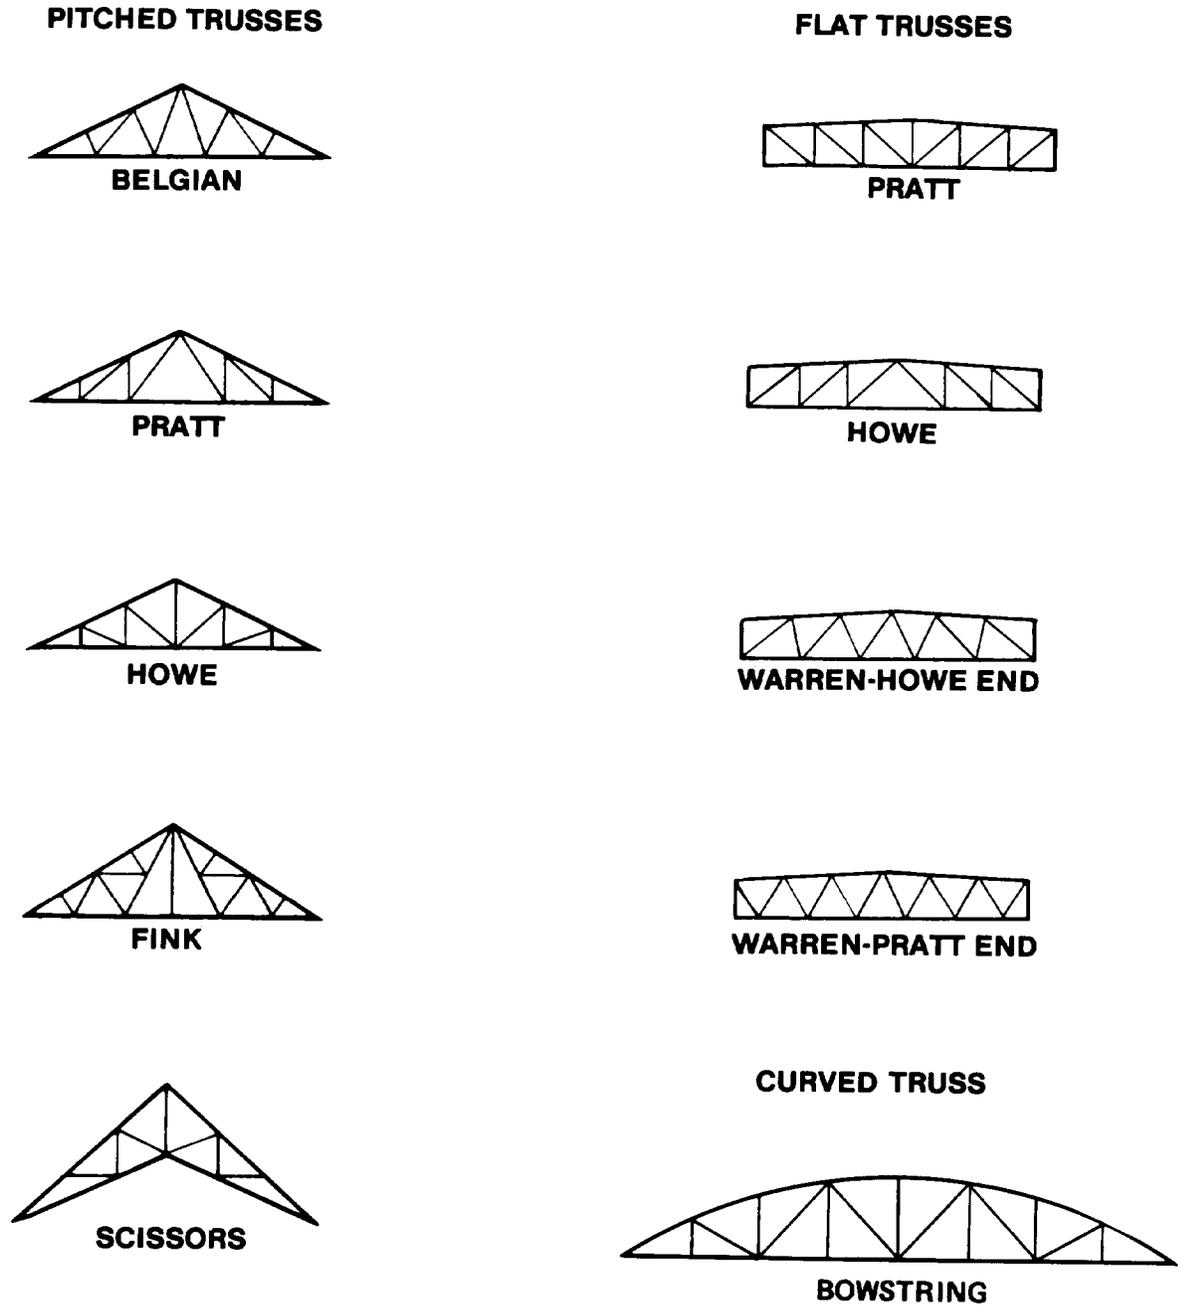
COMMON TYPES OF ROOF TRUSSES.
